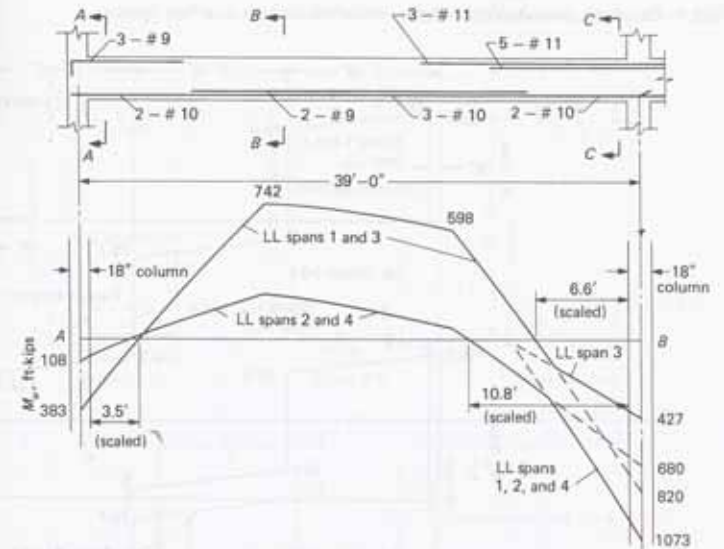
Moment envelope and longitudinal bar arrangement for girder 2G1 (span 1).
